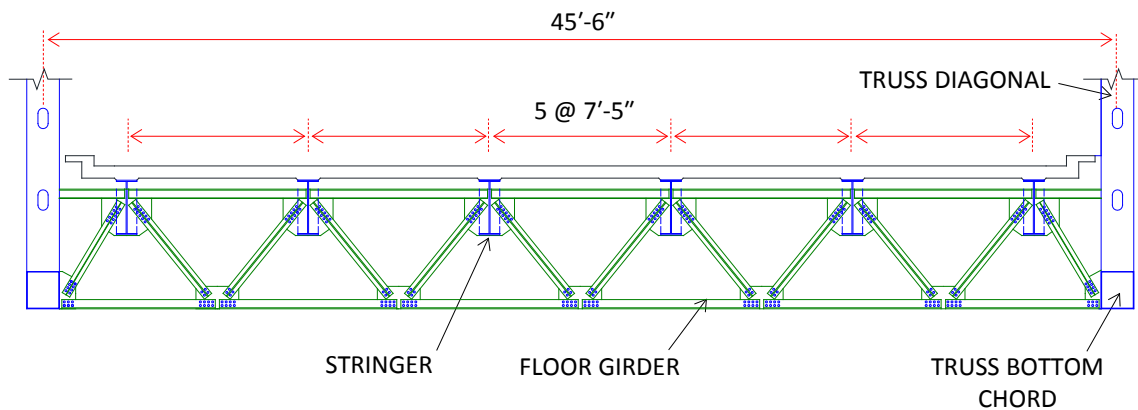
Dimensioned cross-section view of the southbound I-5 Columbia River Bridge constructed in 1958.
